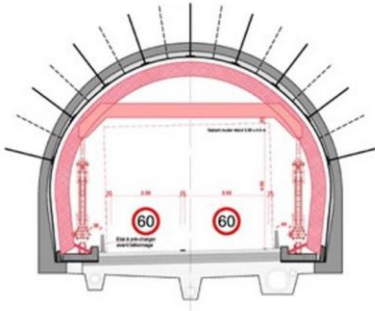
Cross-section showing the formwork system and its fixing concept (anchor lengths shown schematically)
